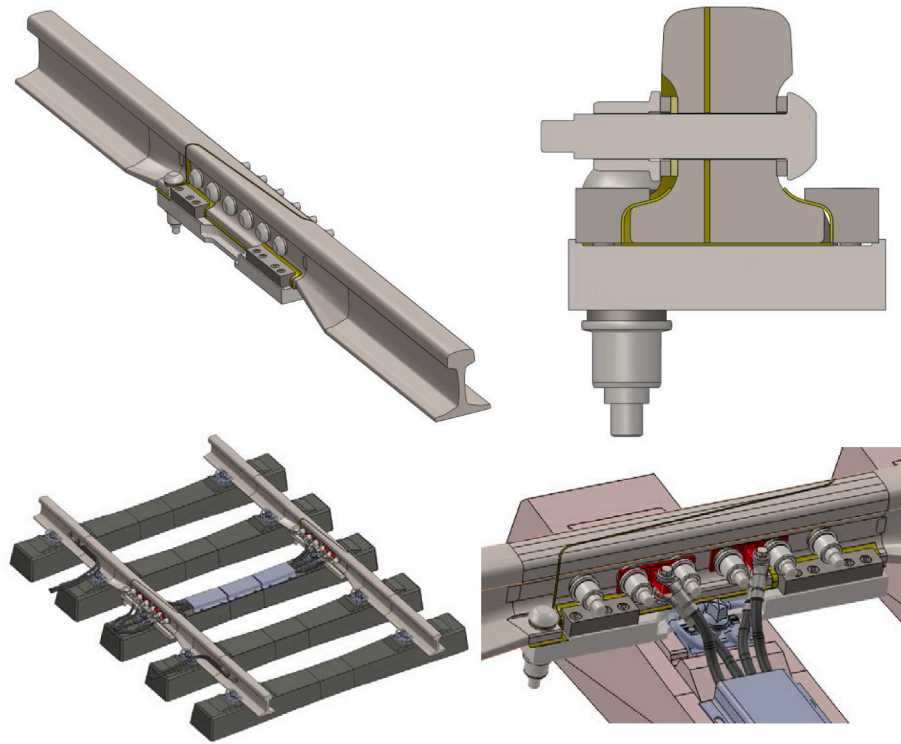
Drawings of a “heavy” version of ABJ with 6 bolts and additional clamps to constrain the rails to the joint cover. Top left: general view. Top right: Cross section at the first lockbolt. Large web thick size can be appreciated. Bottom left: installation in a track with standard rail fasteners, standard sleepers and sleeper spacing. Bottom right: close-up of the cabling using stainless steel elements and bolts as conductors that completely free the tamping area.
